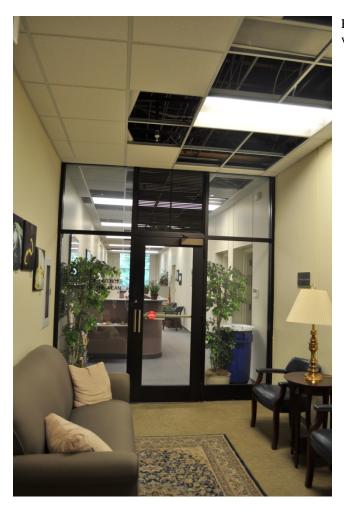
Second floor lobby area looking into west office suite, 2011. *Photo, Beth Grashof.
